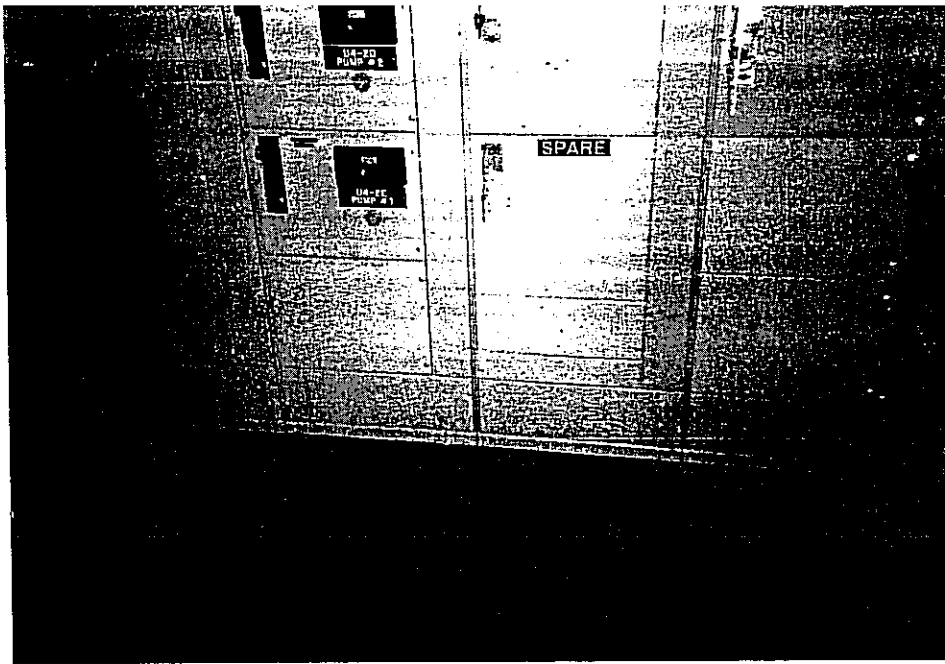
More equipment in the Mezzanine floor. It is unknown whether the equipment is anchored and the anchors are concealed within the metal cabinetry.
